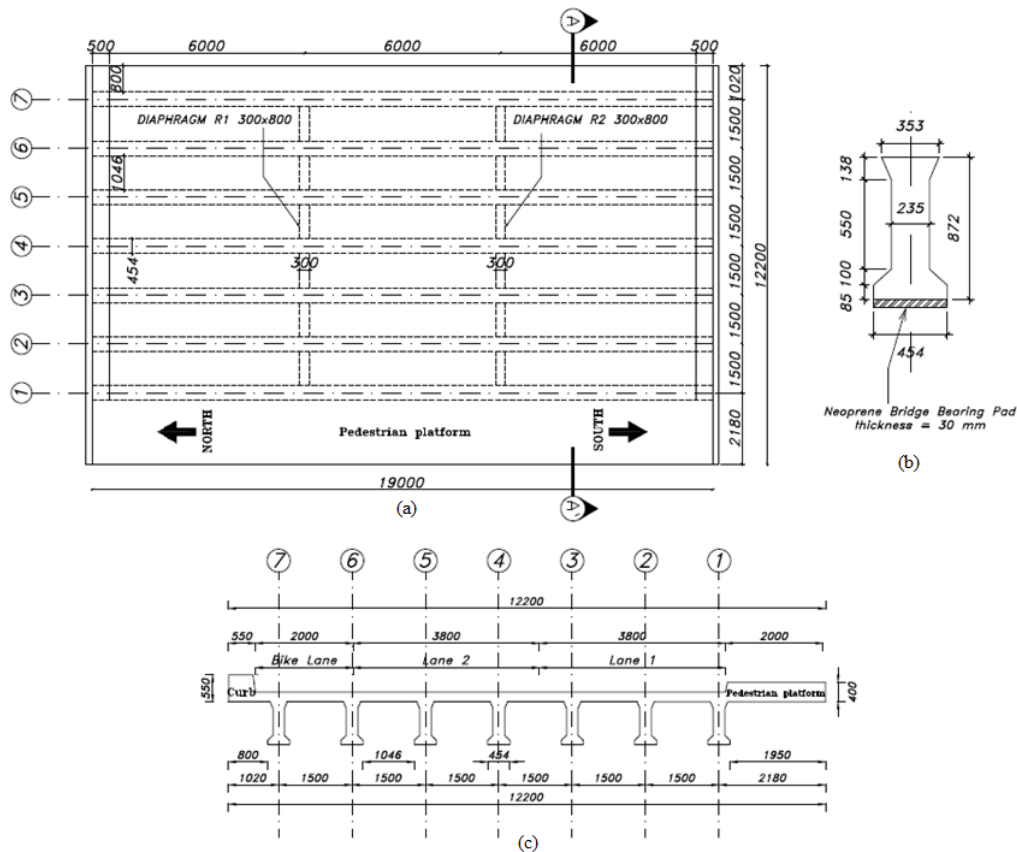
Bridge geometry survey: (a) plan view; (b) beam detail; (c) cross-section view (section A-A').
